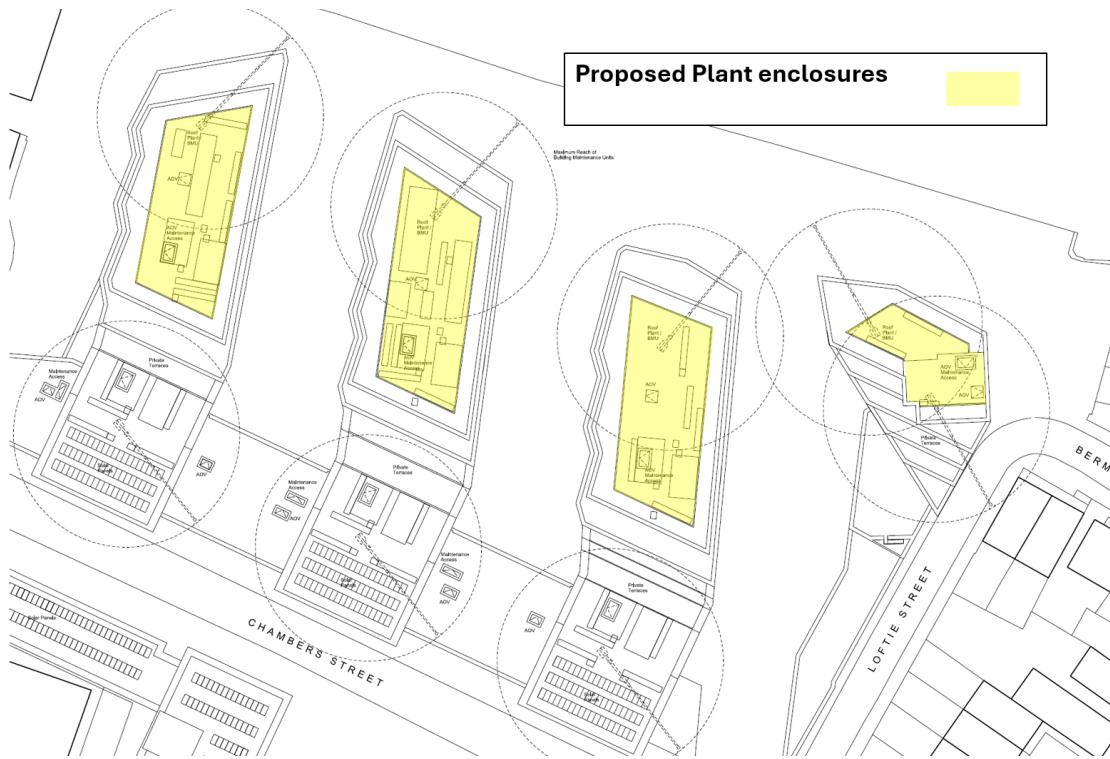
Plant enclosures as shown on proposed plan 115 P8
